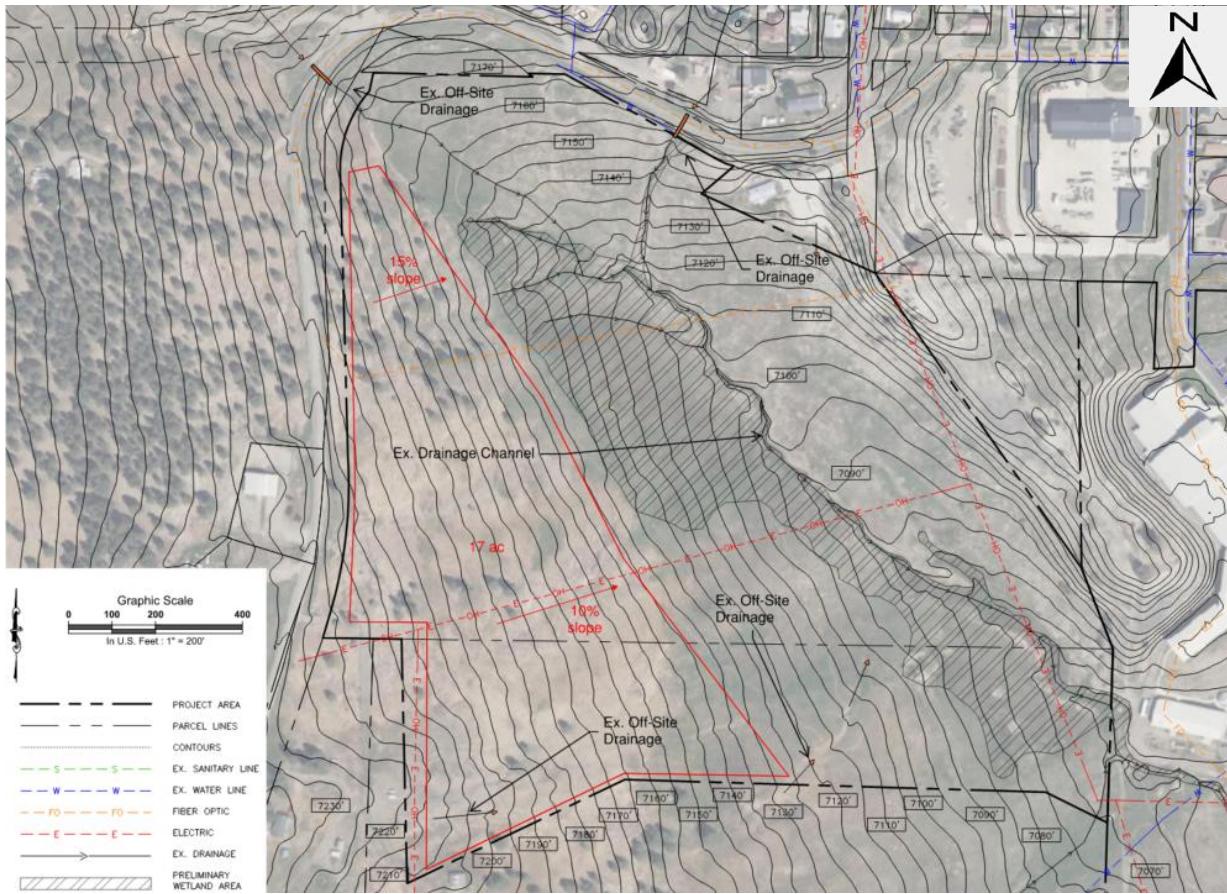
Trujillo Site Topography, Wetlands, & Drainage
